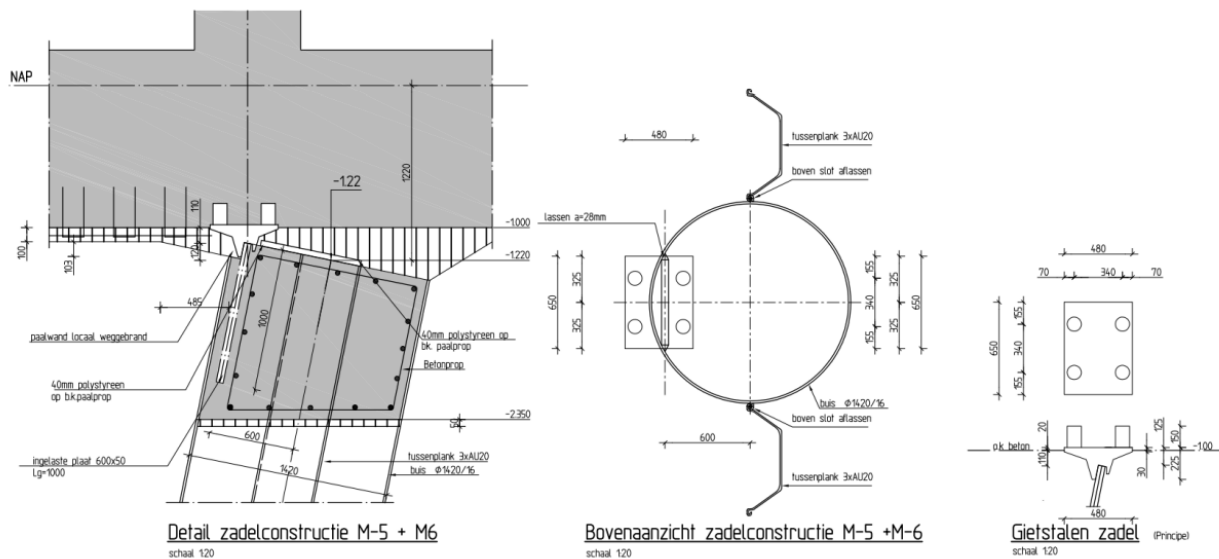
Principle saddle connection between combi wall and superstructure [2]
